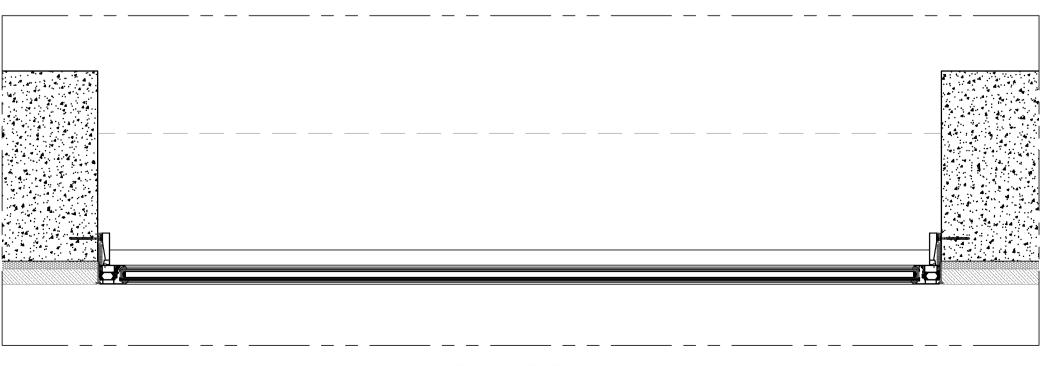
Proposed Kingsway Openable Window Unit
